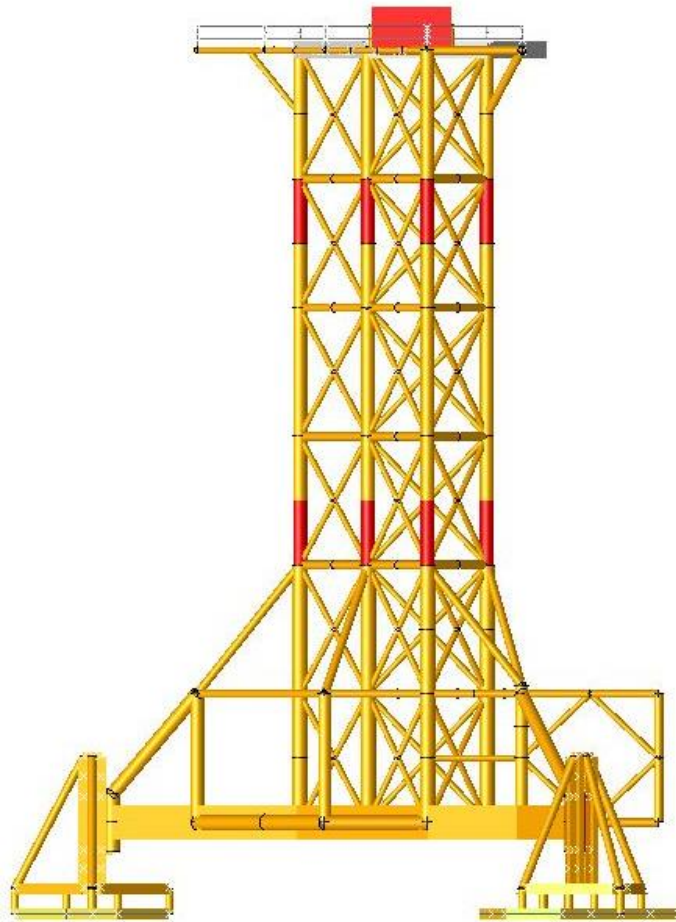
Members to be Connected by Bolted Flange Connections
